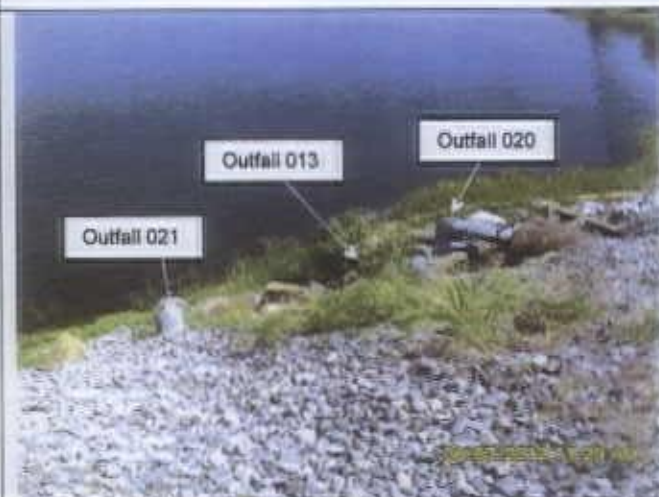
Outfall 013, Outfall 020, and Outfall 021.
